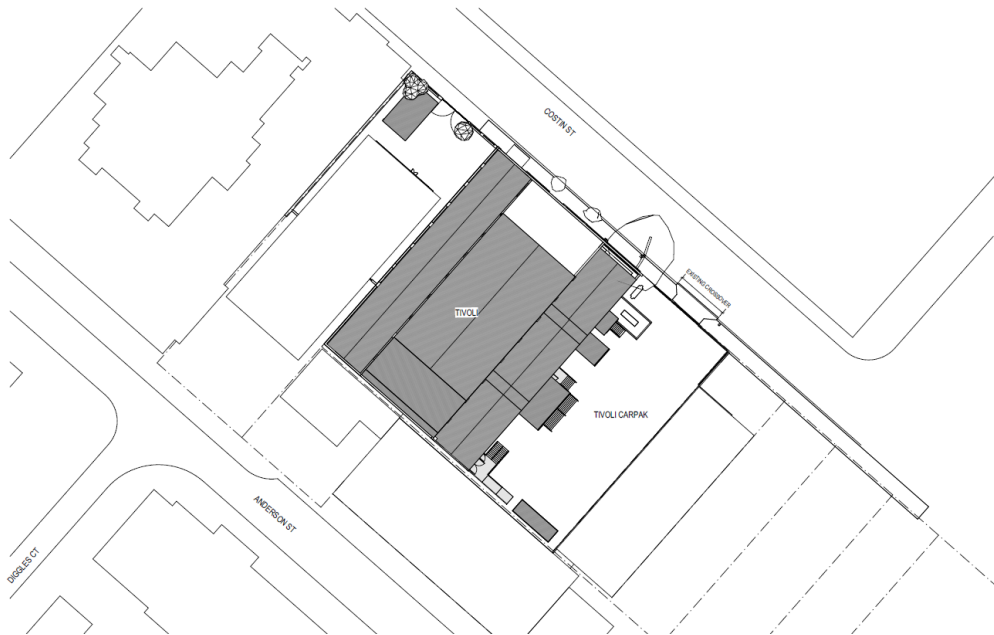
Existing Site Plan (Source: JDA Co.) – refer attached PDF for full drawing
